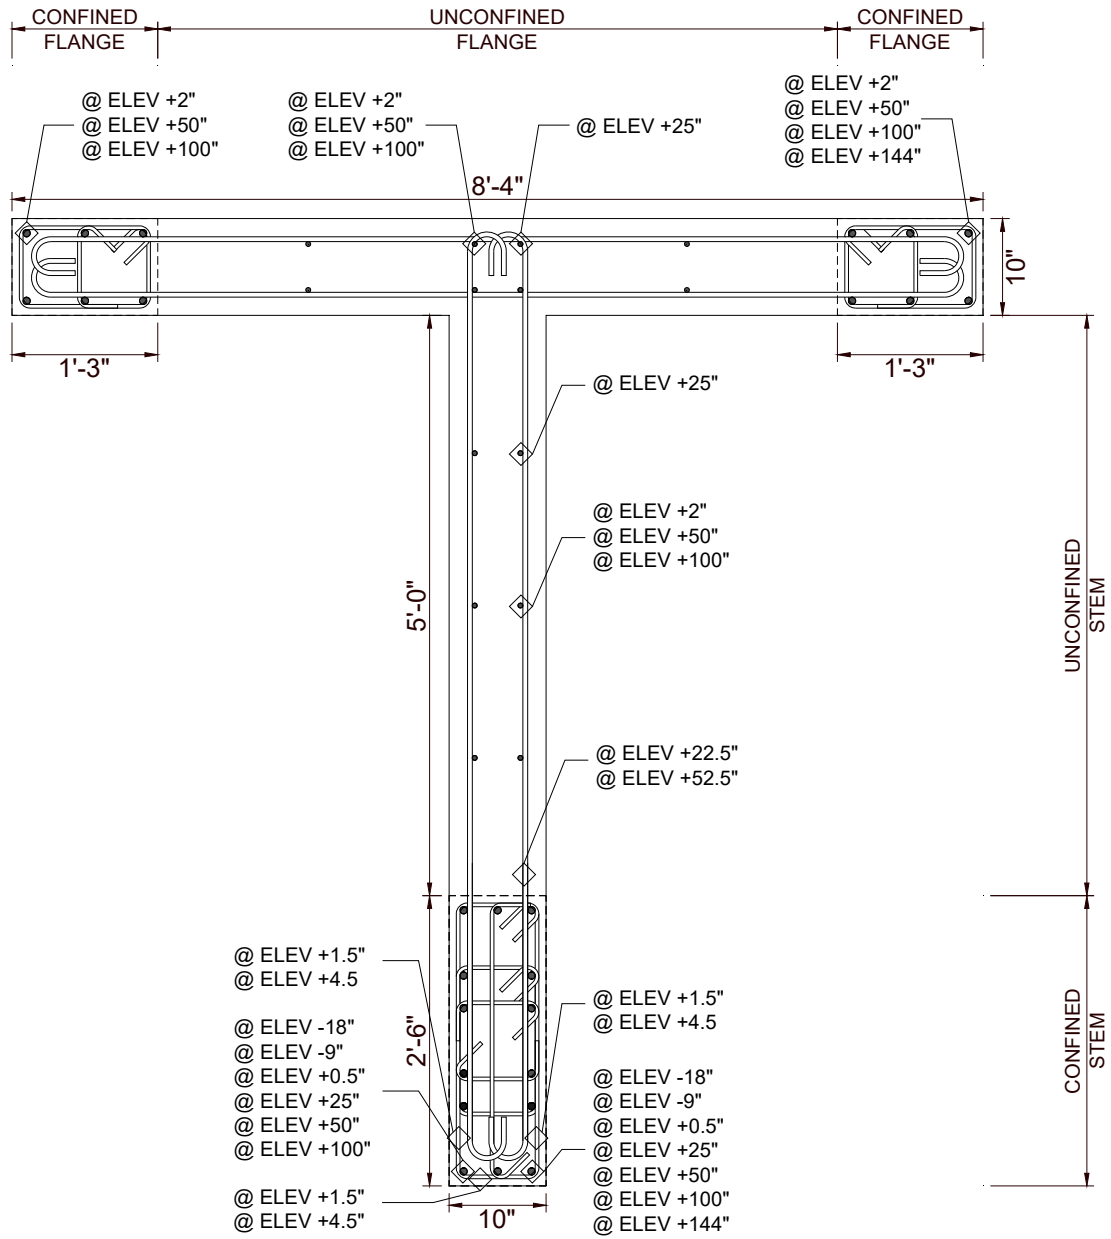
Strain gauge locations in T6 (1 in. = 25.4 mm)
